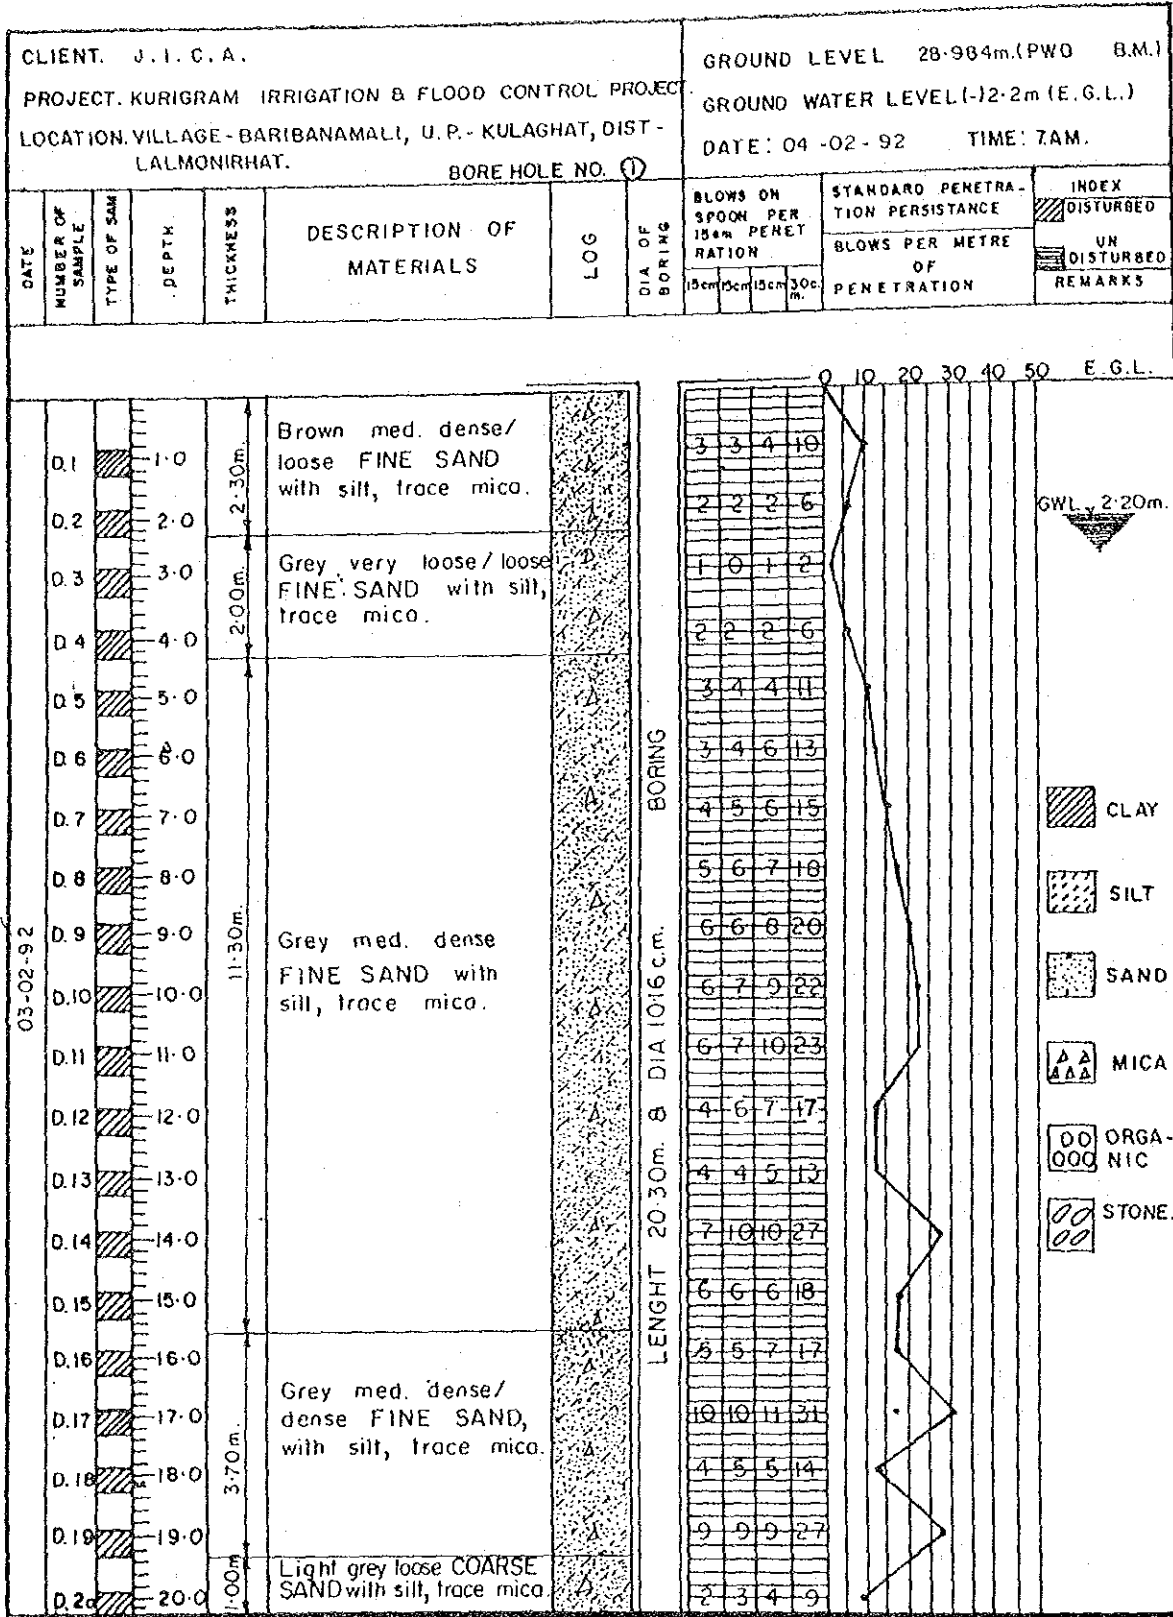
PROPOSED PUMPING STATION SITE (7/8)
